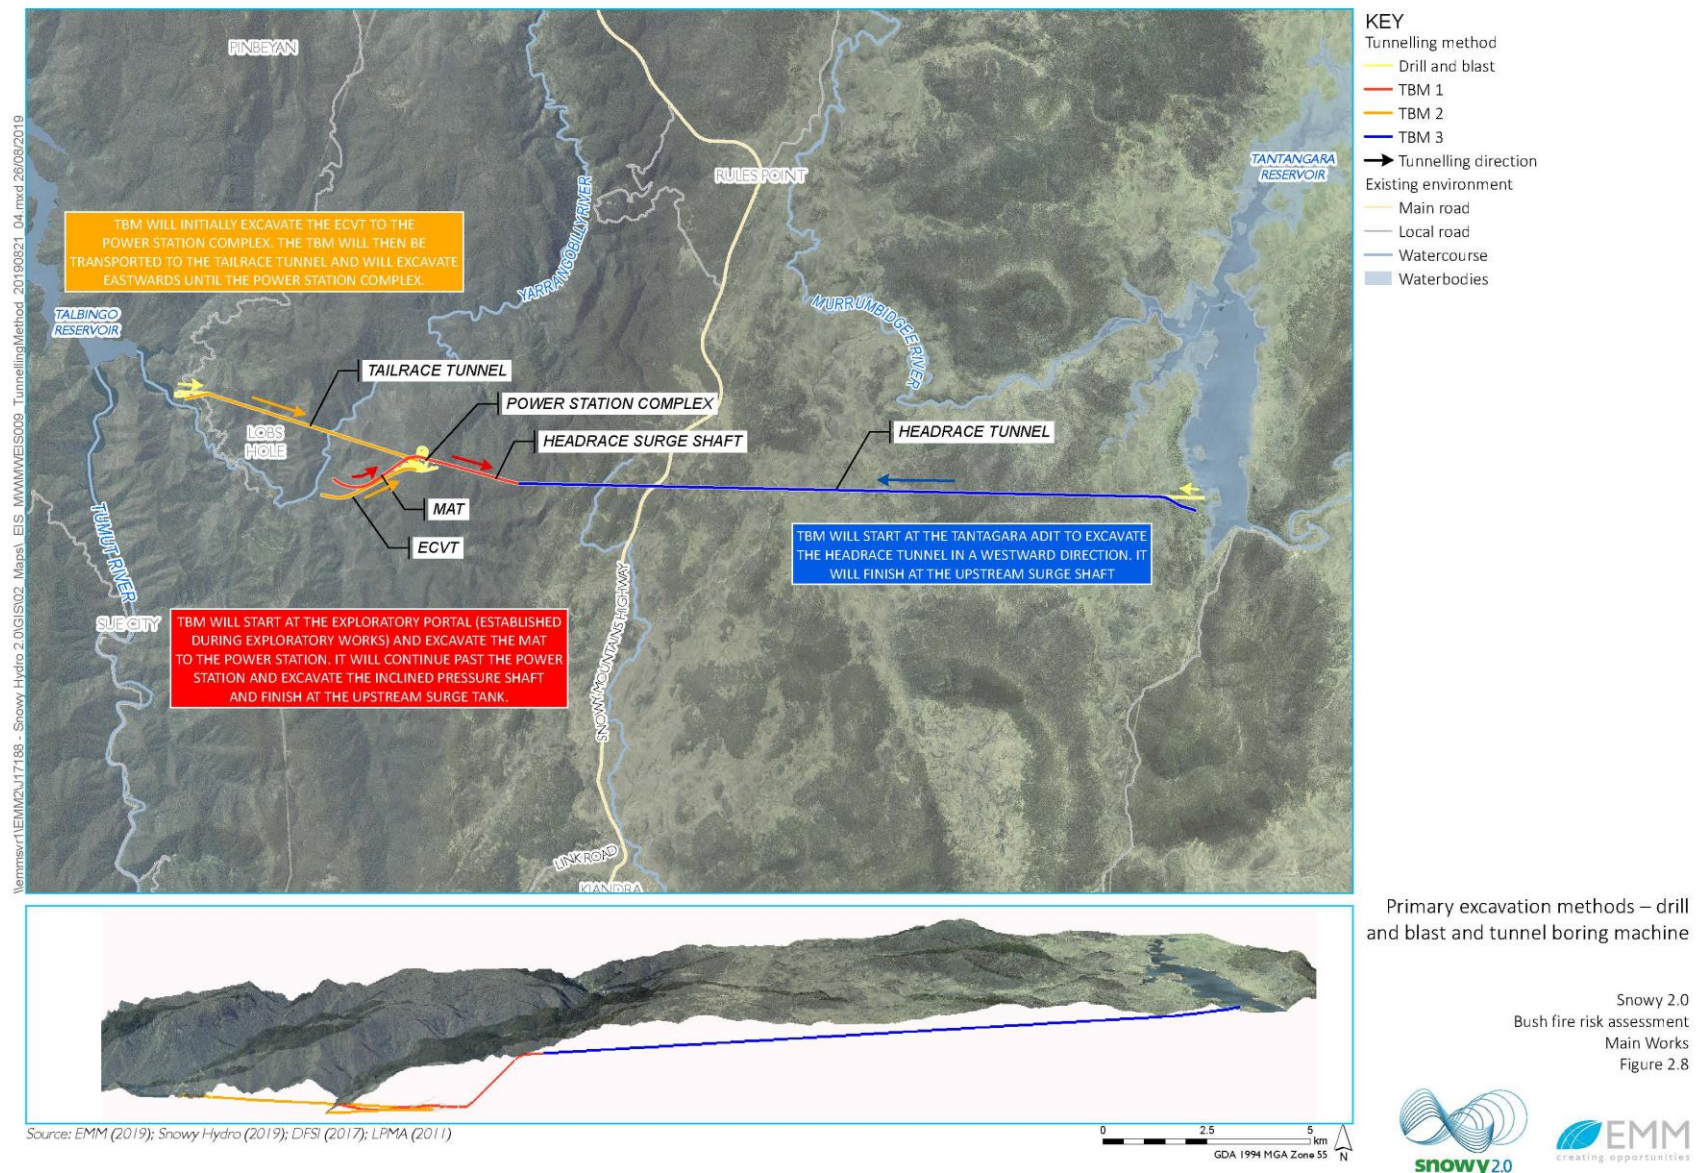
Primary Excavation Methods - drill and blast and tunnel boring machine
